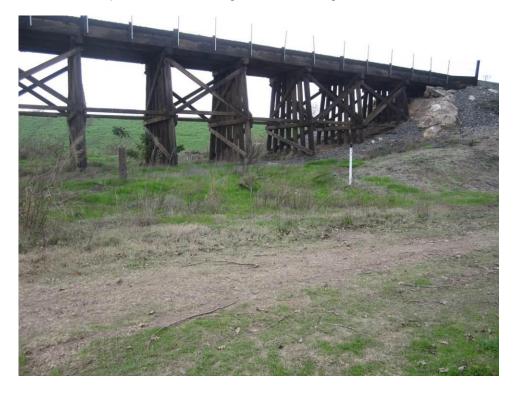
Upstream face of Bridge 143.71, looking TT West.
